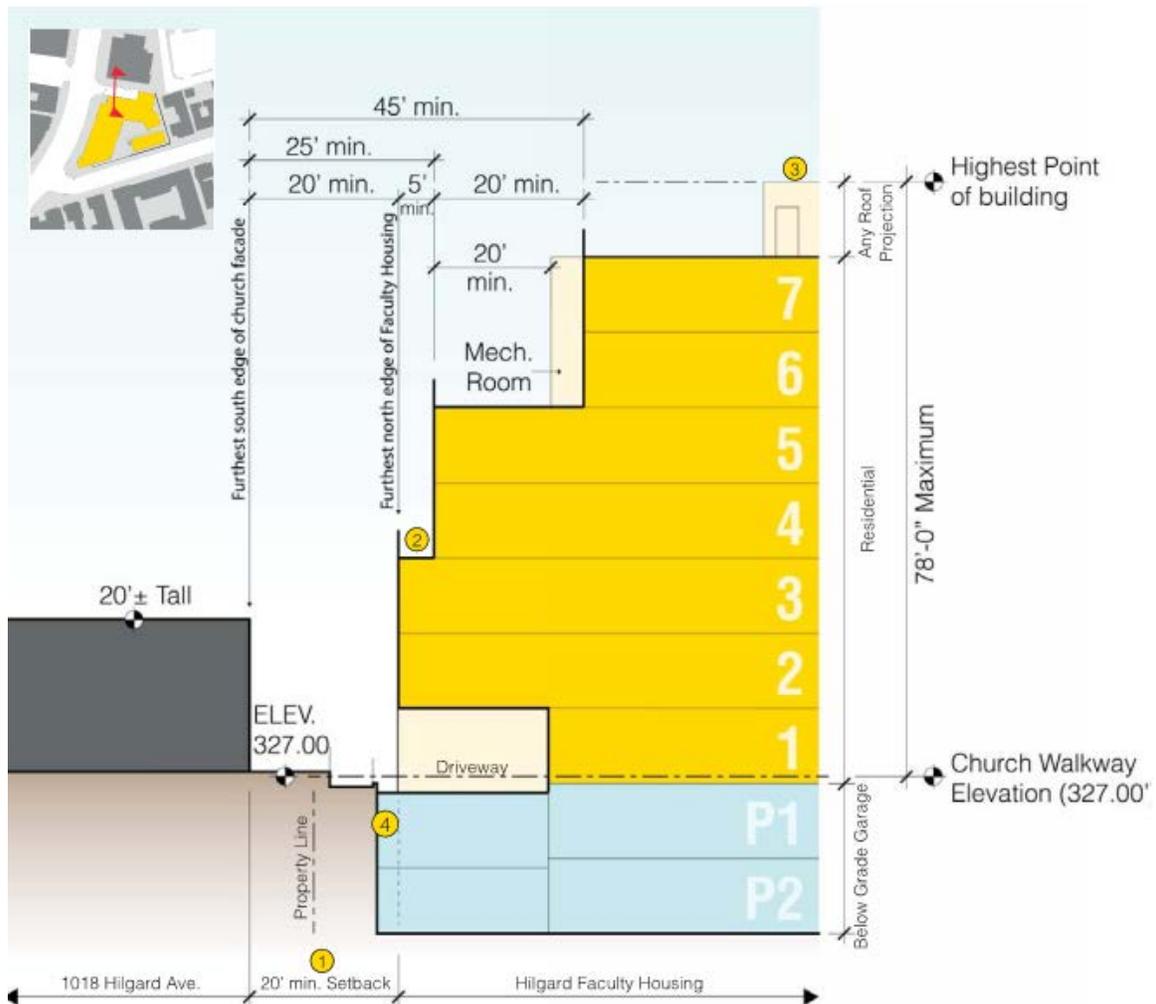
Section showing overall seven-story height and stepbacks at the north façade at the 3rd and 5th floors. Source: Detailed Project Program, Moore Ruble Yudell Architects & Planners.
